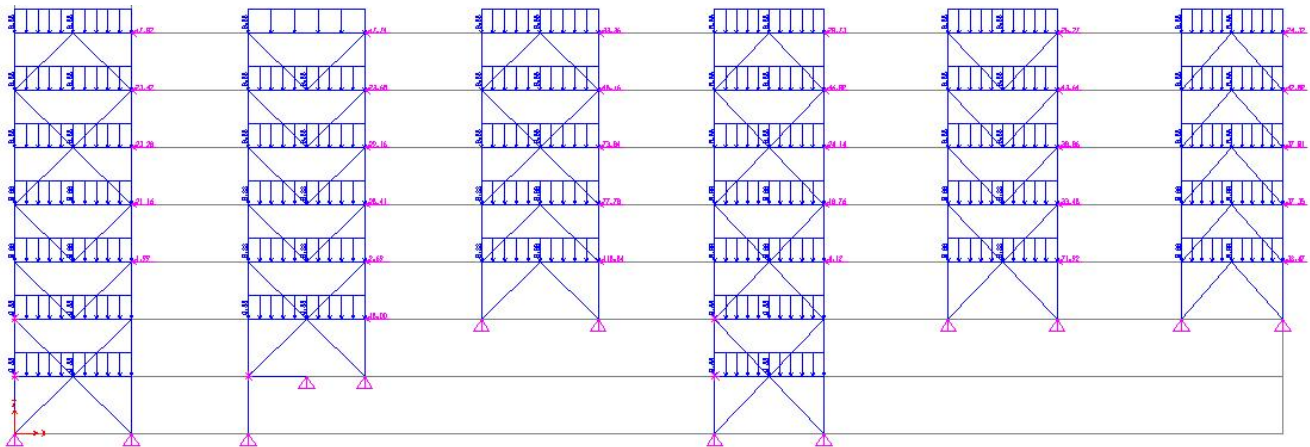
Full gravity and calculated lateral loads for connection designs
